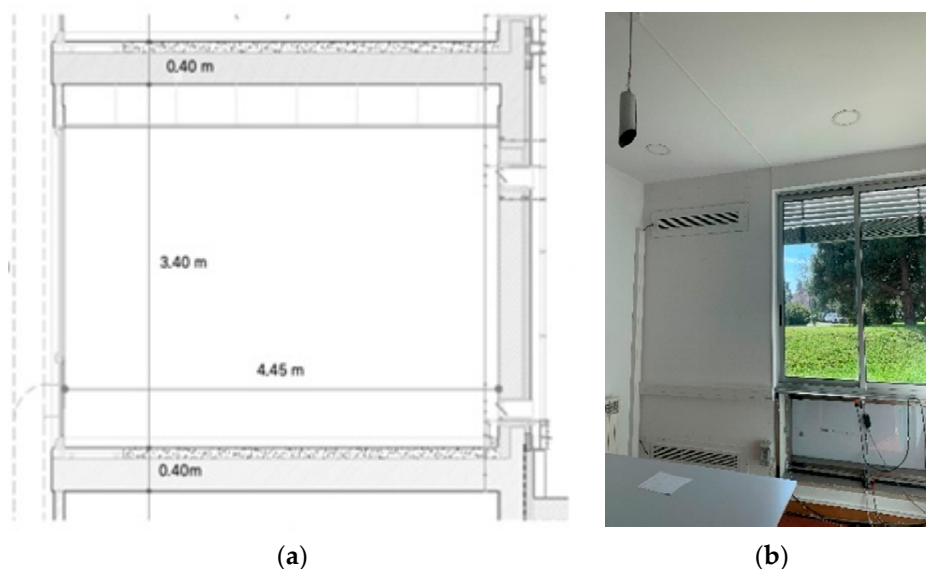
Test room: (a) cross-section view; (b) indoor picture and Building Integrated Photovoltaic Thermal (BIPVT) system.
